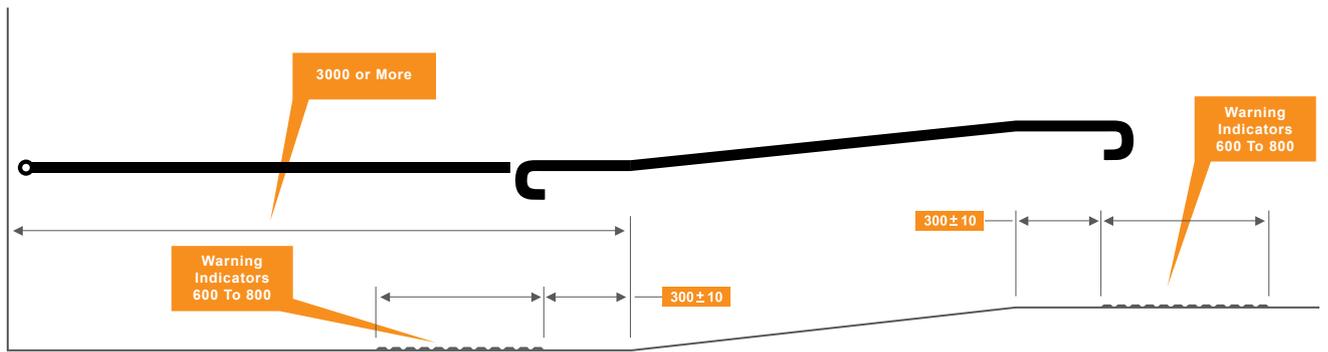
B: Warning Indicators - Ramps. Side elevation where top of ramp leads to an open area and the bottom landing is enclosed, 3000 or more wide and/or handrail is discontinuous
